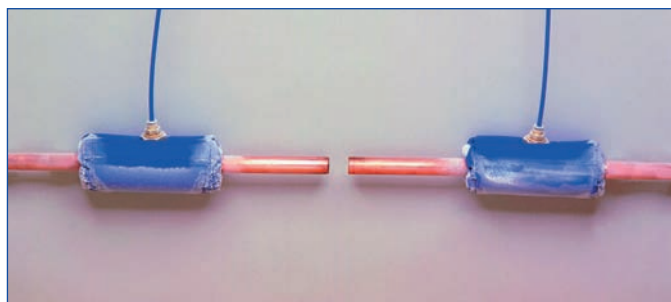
Shows a section of pipe removed in order to insert a compression fit Equal -T Note the freezing jackets left in place whilst work is carried out.
